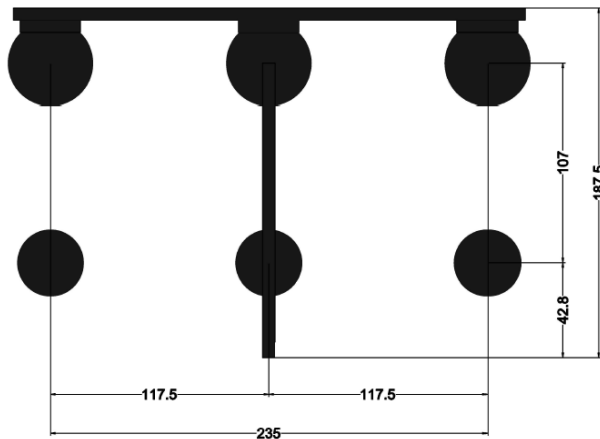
Extended 2 Numerical Model Cross-Section Dimensions. (All dimensions given in the figure are in millimeters.)
